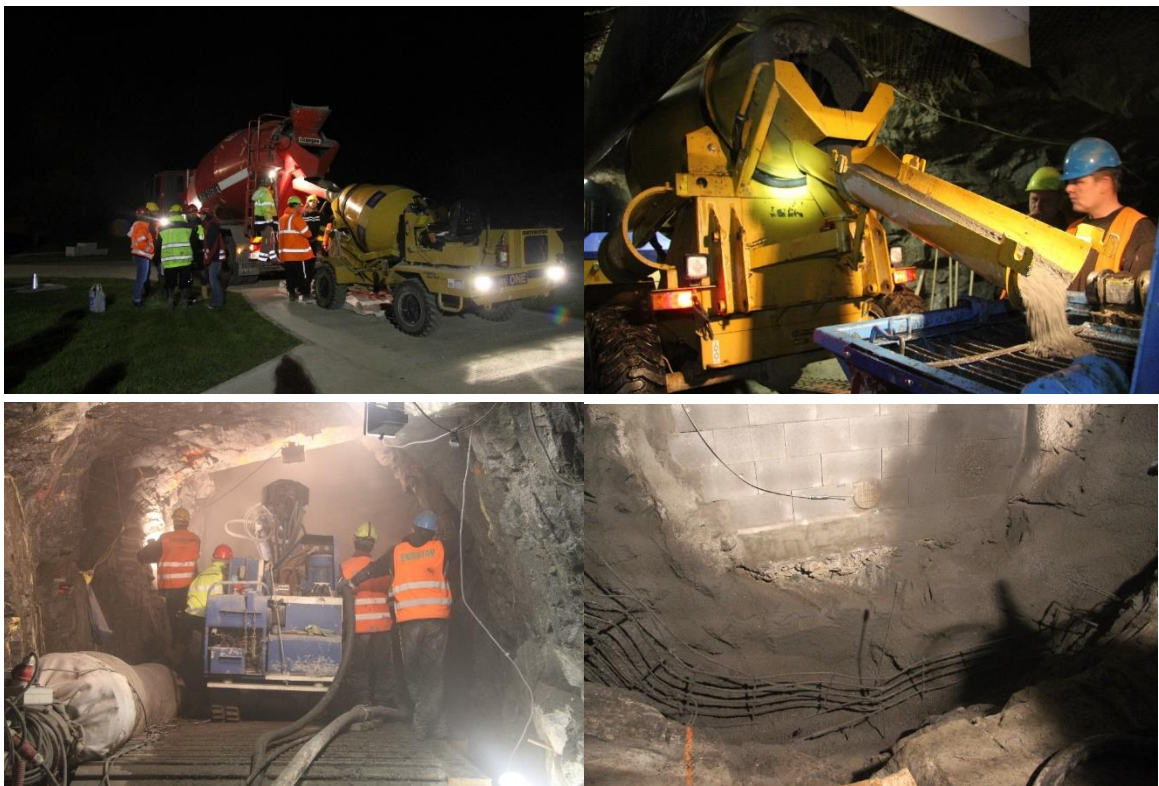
Inner plug erection and sensor installation (12/13 December 2014) – reloading of the concrete mix, offloading the mix into the pump, shotcreting machine, first batches sprayed, instrumentation installation, finished plug
